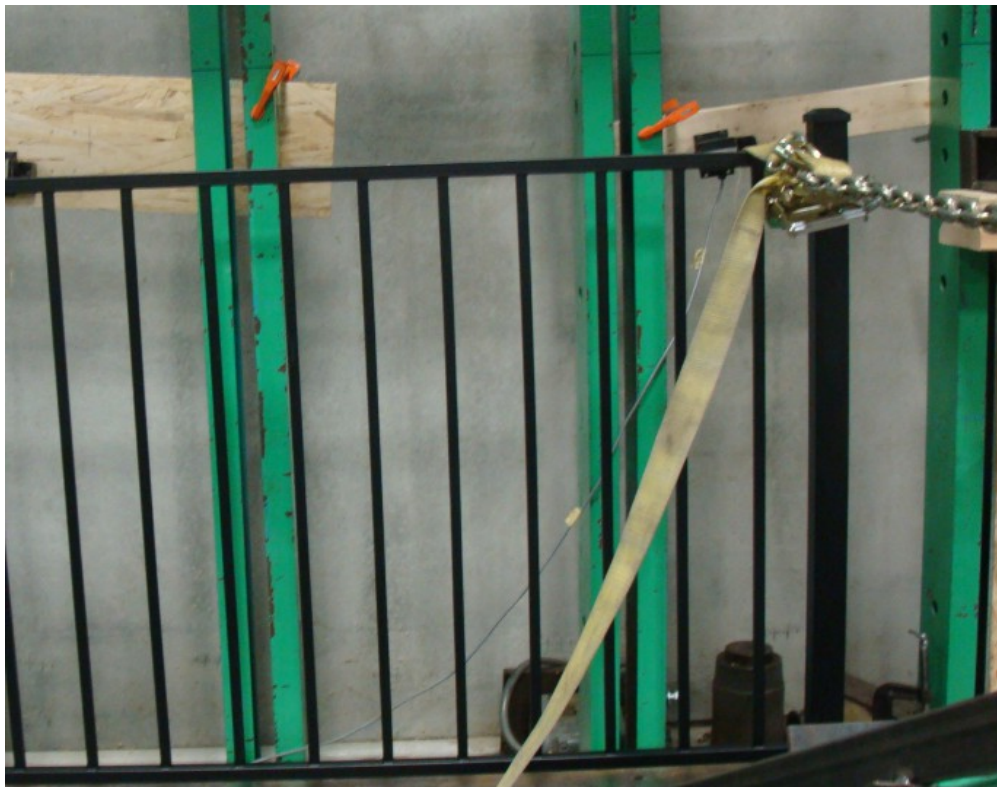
200 lbf Load Applied – Horizontal Near Post Connection
